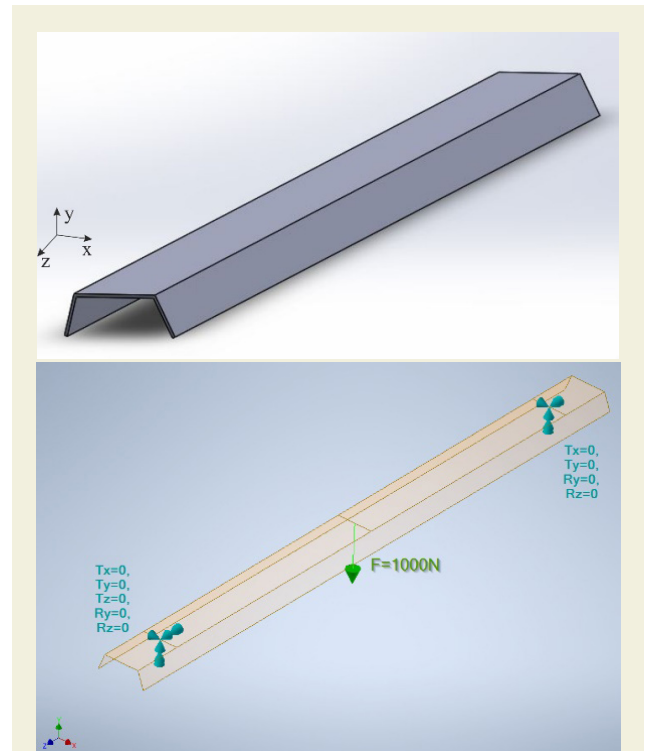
V shaped structural floor element CAD (left) and FEM model (right)
